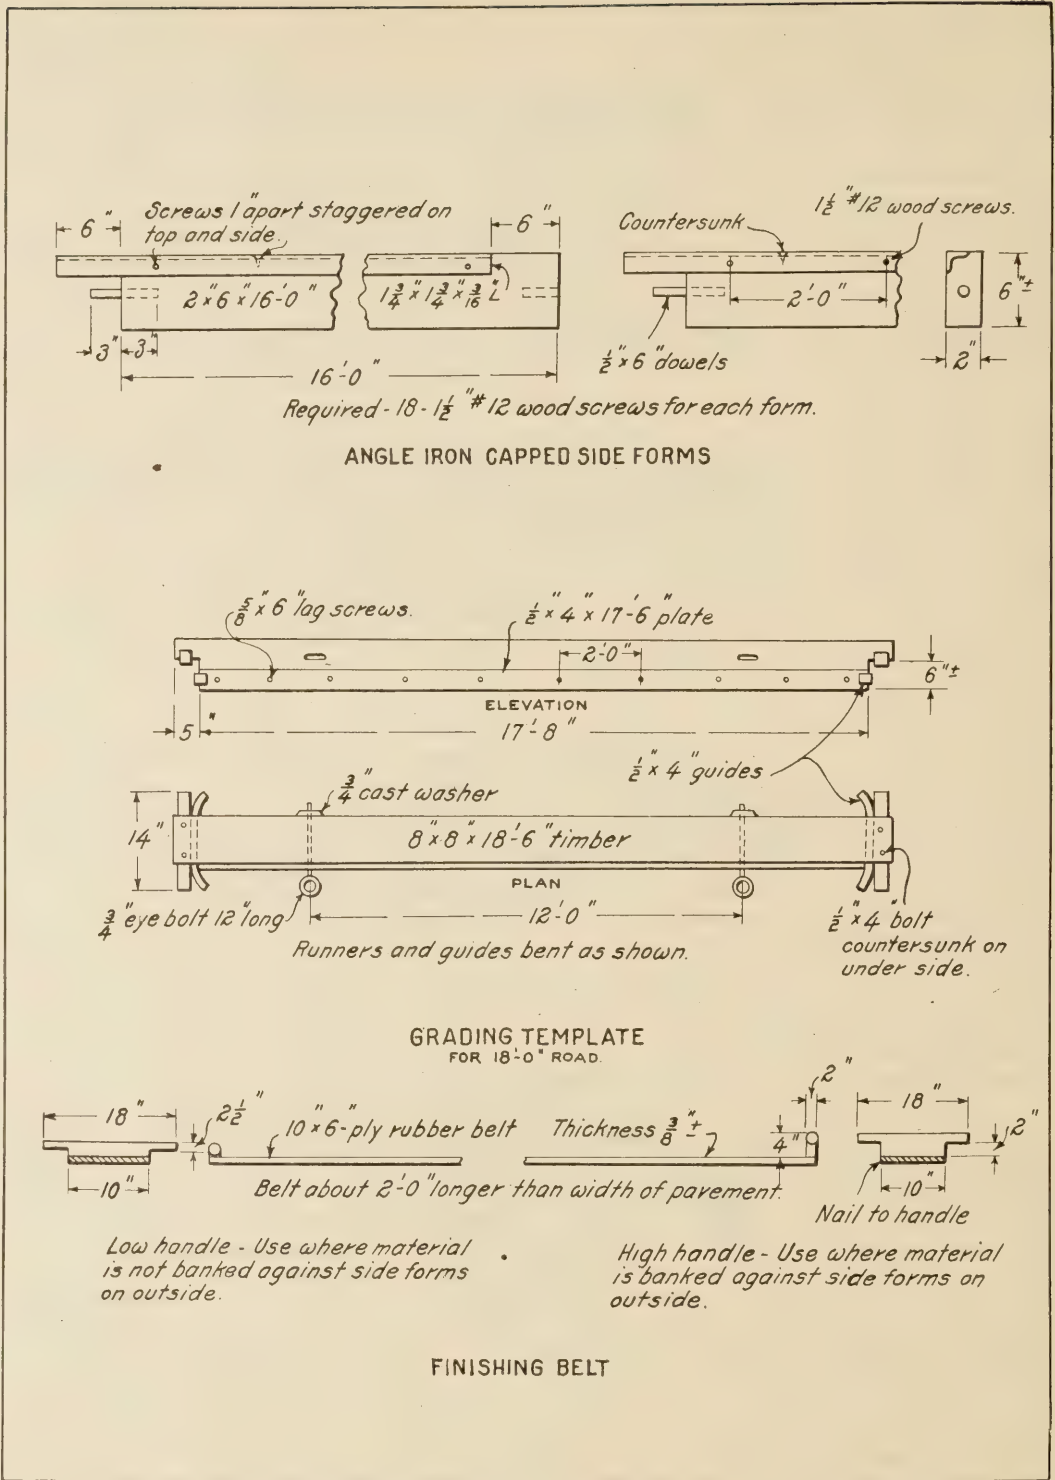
PLATE II. TOOLS USED IN THE CONSTRUCTION OF CONCRETE PAVEMENTS.
